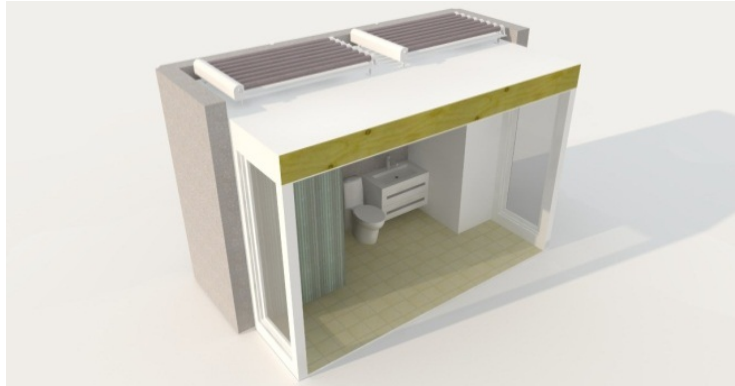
View of a Solar Thermal REEM as a modular component capable of being set in place with a small crane. The REEM contains a full bath that includes a vanity, toilet, and shower as well as a small mechanical room that houses the water heater and other Solar Thermal components, or can be configured as a laundry/mud room.
